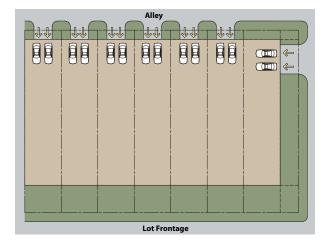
Vehicle access and drives are to be located behind the principal building, no front driveway access is permitted.
